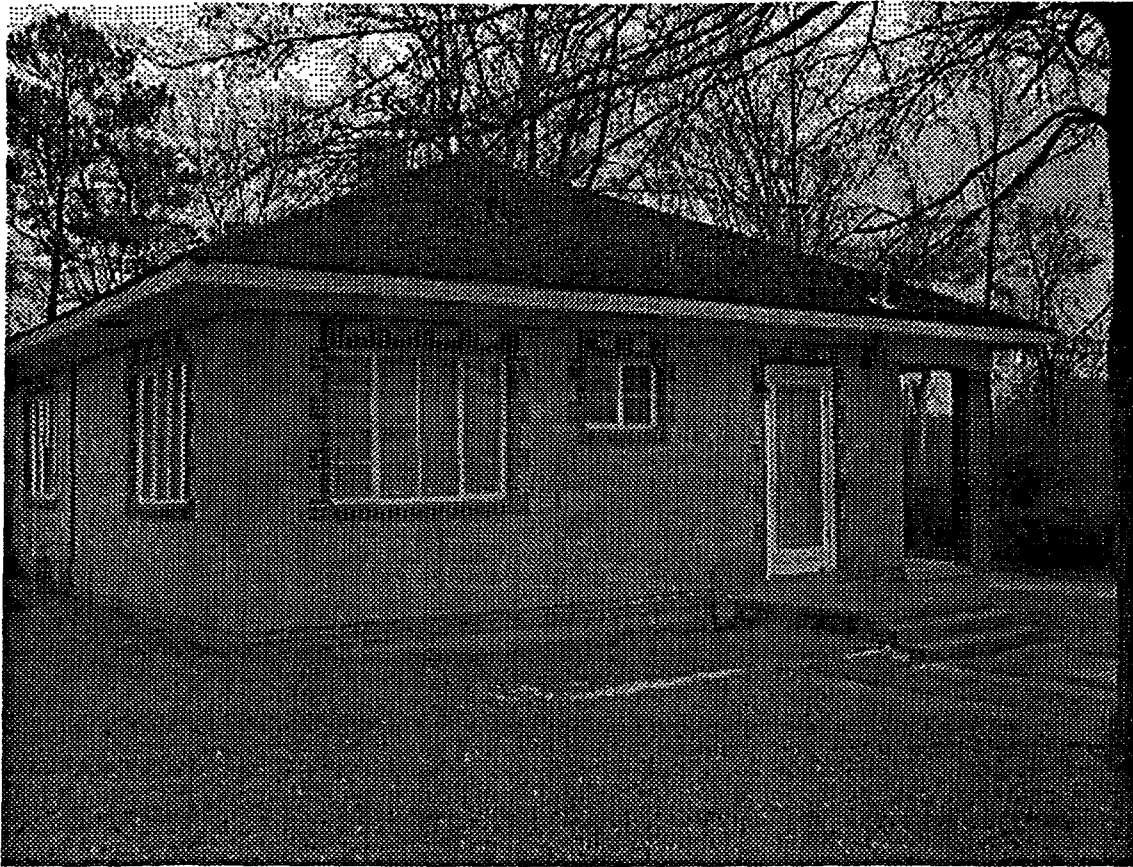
An example of the "Tuskegee Concrete Block" House developed in 1950.
